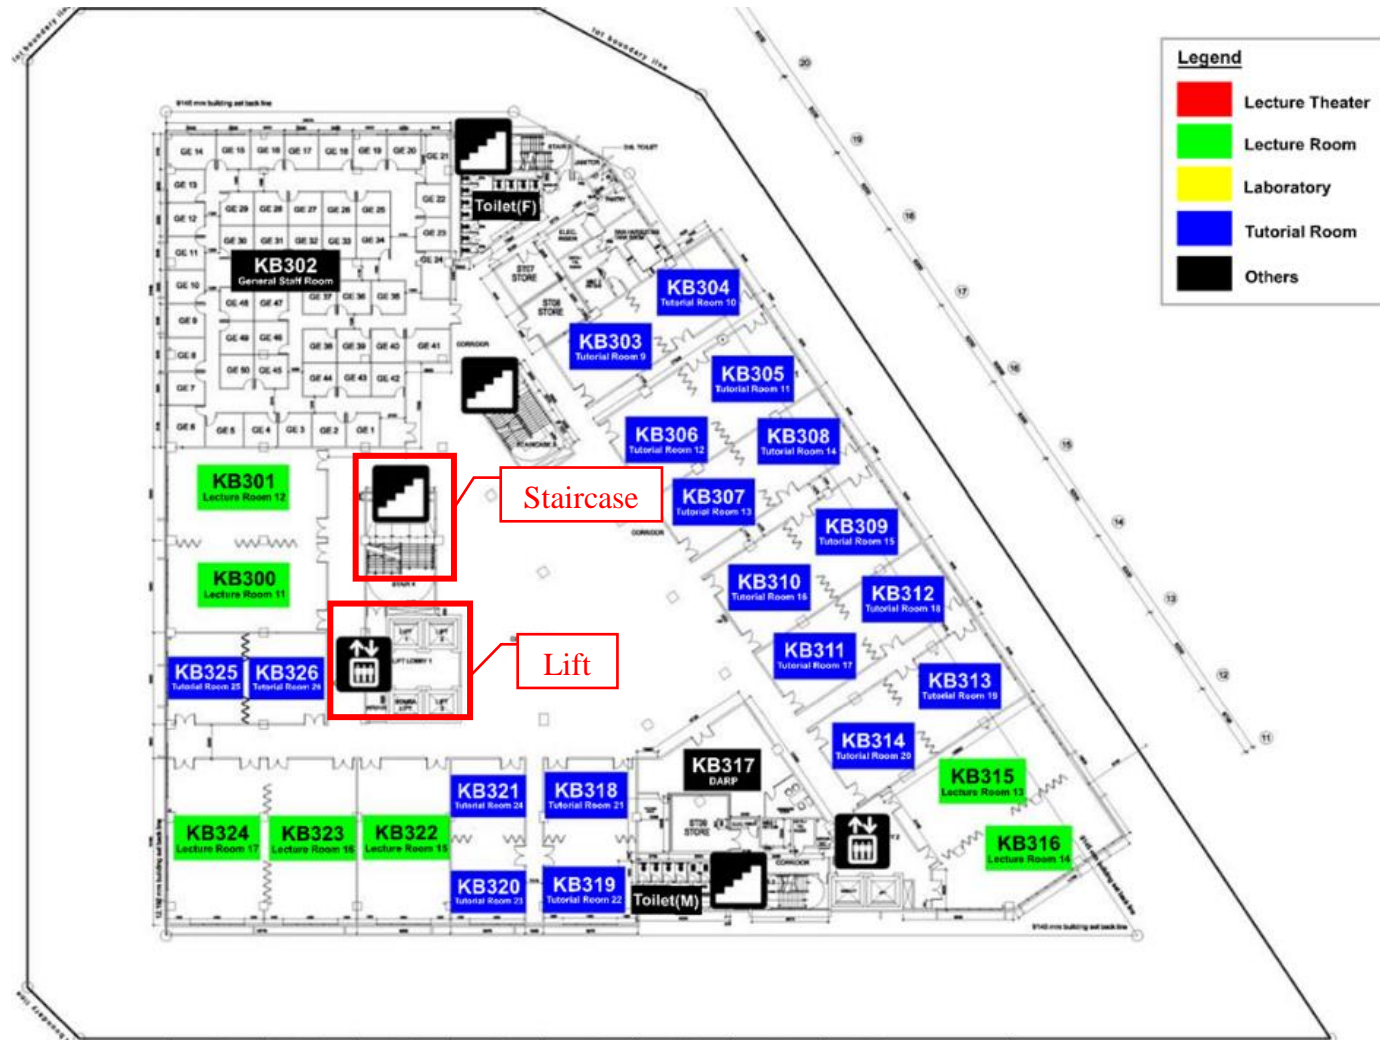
Sungai Long KB building floor plan – 3rd floor.
